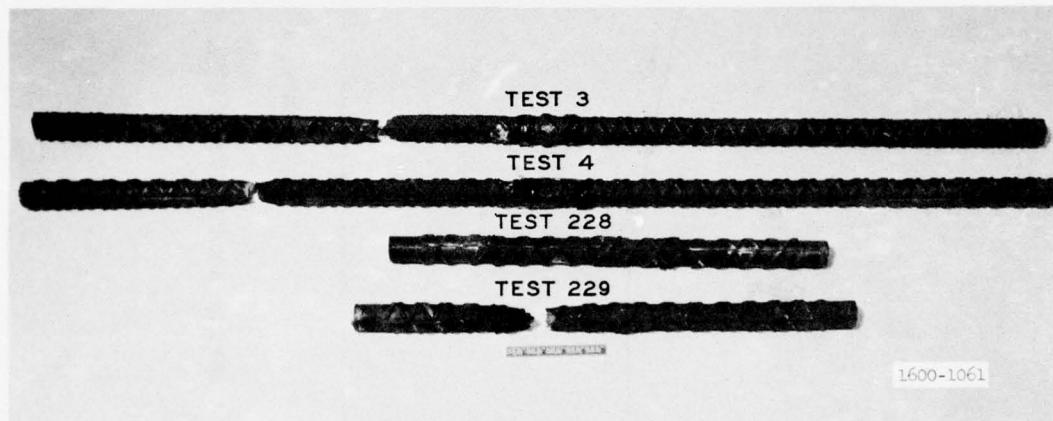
Posttest, double-vee groove weld butt splice samples.
